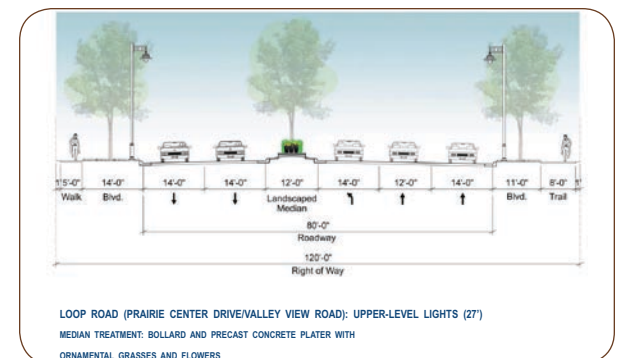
Loop Road Typical Cross Section (Prairie Center Drive/Valley View Road)
